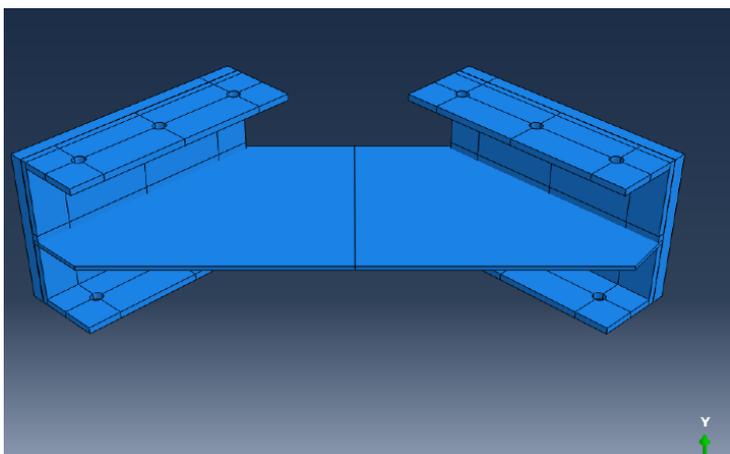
Single Plate 8 mm tk. Welded Haunch
